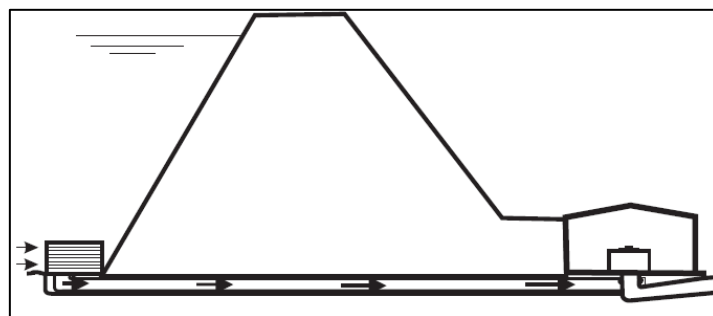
Bottom outlet scheme (Penche and De Minas, 1998)
